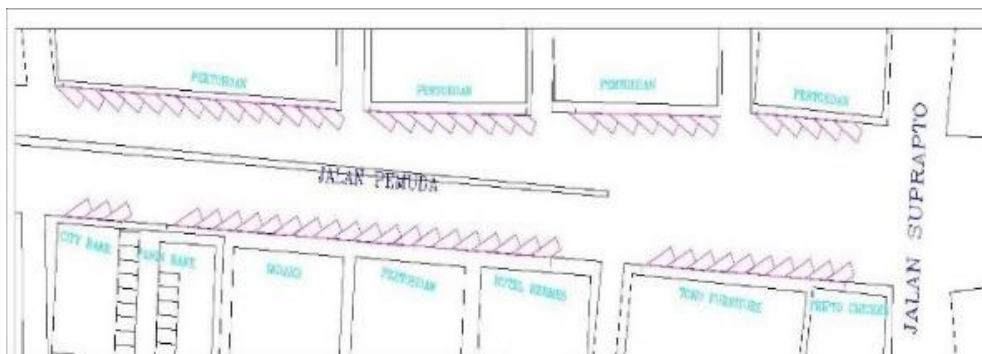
Alternative parking arrangement 4 Section A corner 30°
